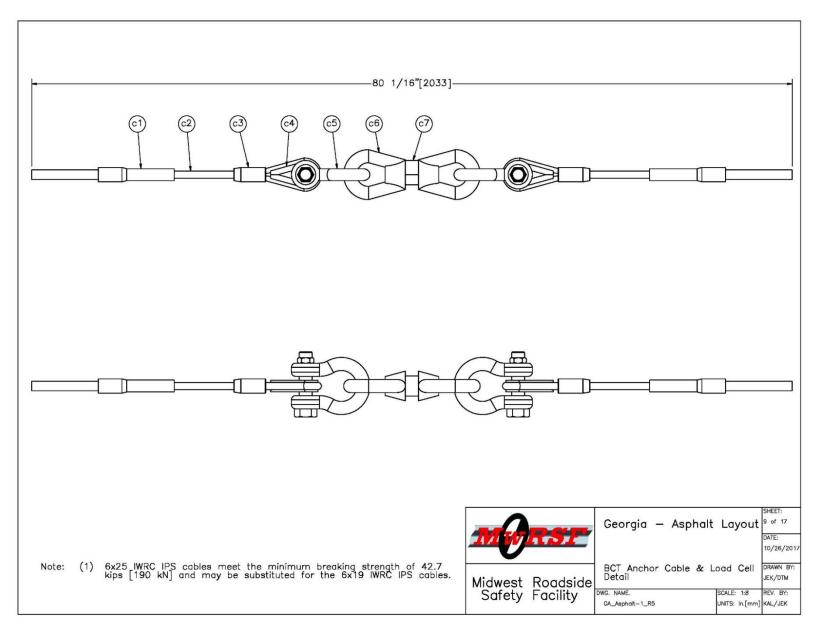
BCT Anchor Cable and Load Cell Detail, Test No. GAA-1
